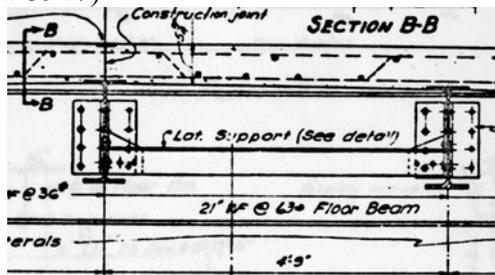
Floor-beam bracket (Bridge # 5947)
